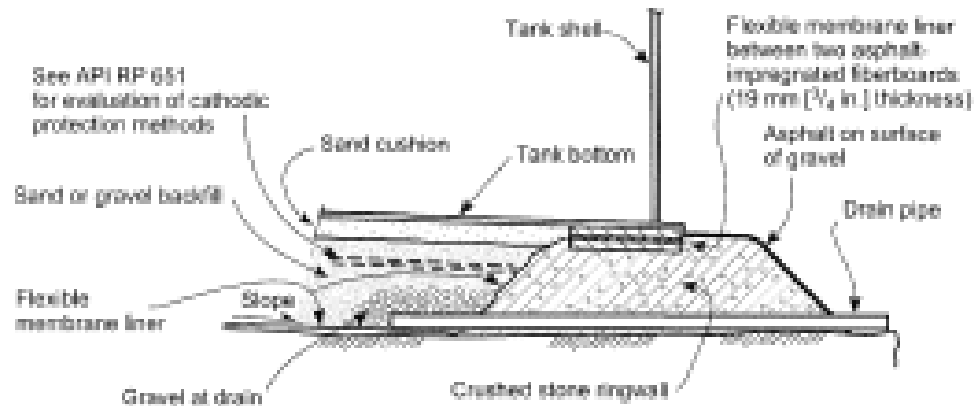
Crushed Stone Ringwall with Undertank Leak Detection at the Tank Perimeter (Typical Arrangement)
